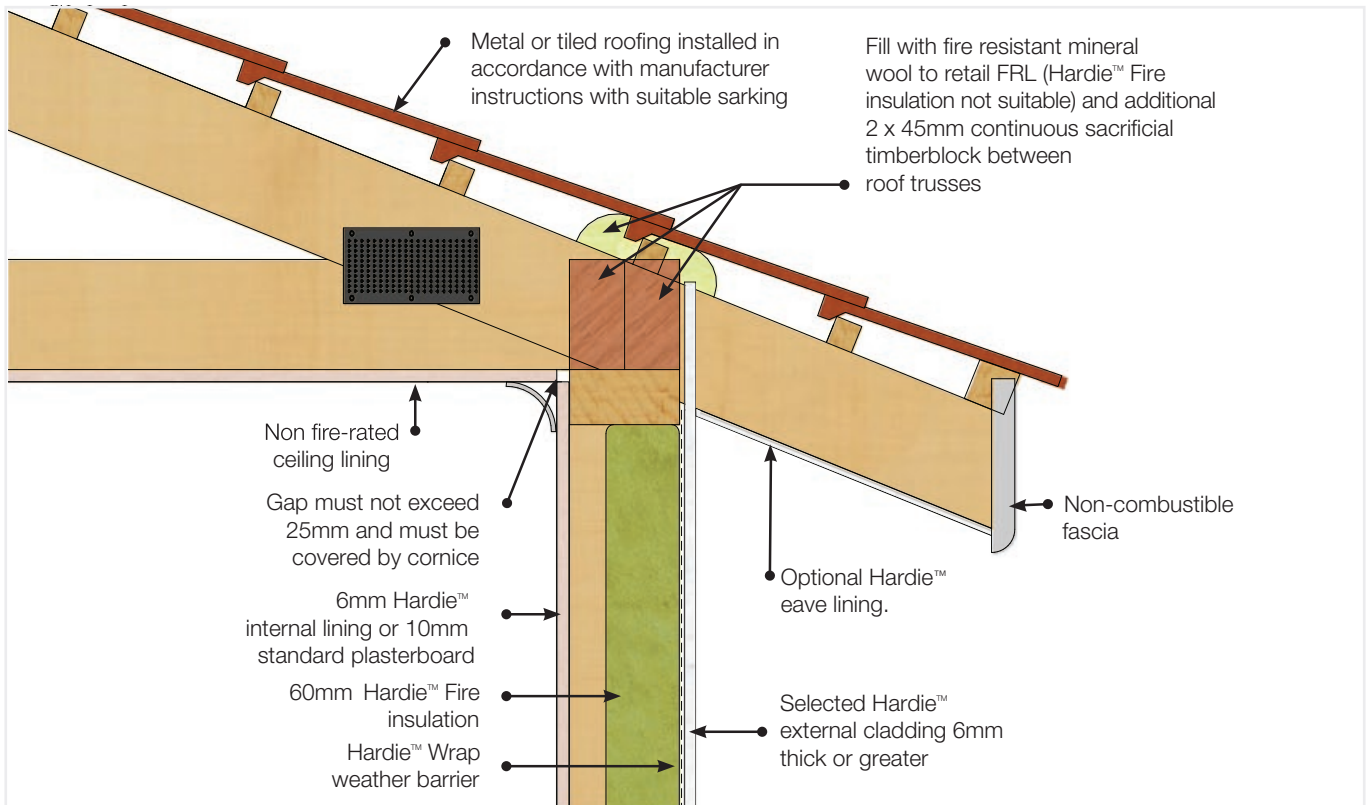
EXTERNAL BOUNDARY WALL TO ROOF WITH EAVE
